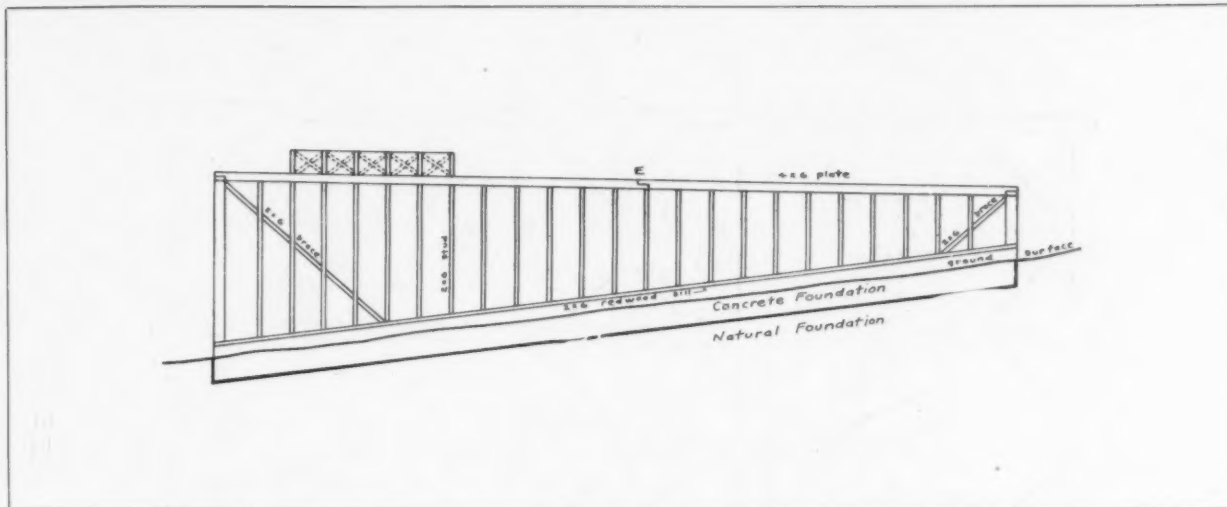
Poorly Braced Underpinning on Sloping Foundation, without Anchor Bolts
